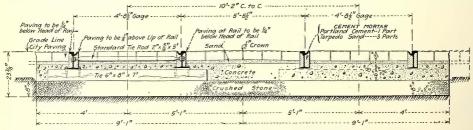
CHICAGO STANDARD TRACK TYPE NO. 3; CRUSHED STONE WITH WOOD TIES IMBEDDED IN CONCRETE
